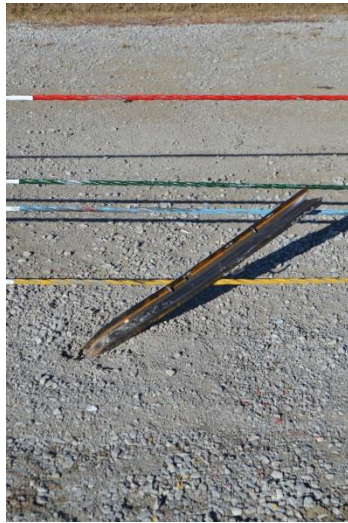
System Damage, Cable Brackets, Test No. MWP-4
